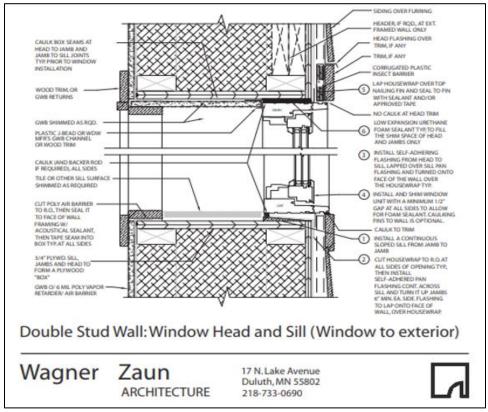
Double Stud Wall–Window Head & Sill (Window to Exterior)
